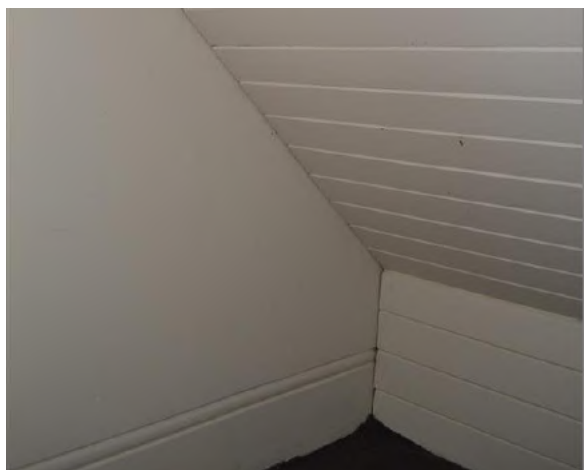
V-jointed boarding to stair soffit visible in cupboard under the stair—46A/46–56 Gloucester Street. (Source: GML Heritage July 2016)
